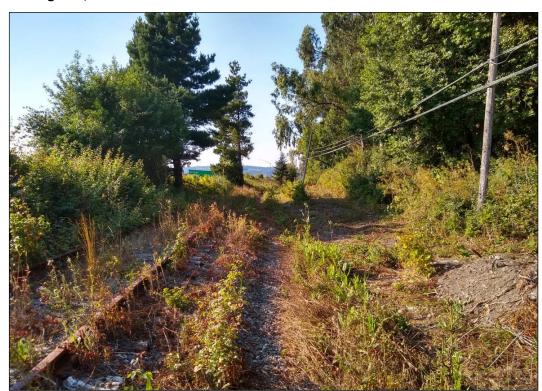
Looking north within proposed Route D-3 alignment. Note railroad tracks, gravel, and poison oak dominance. Also note California bay trees and eucalyptus on slope. Photo taken August 9, 2018.
